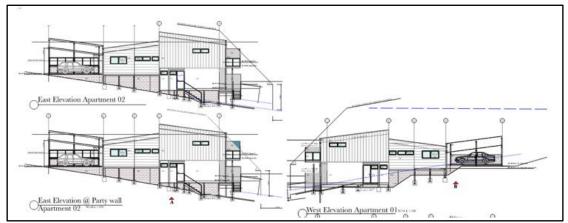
Sections Outside Building Envelope - Modern Architecture Practice
